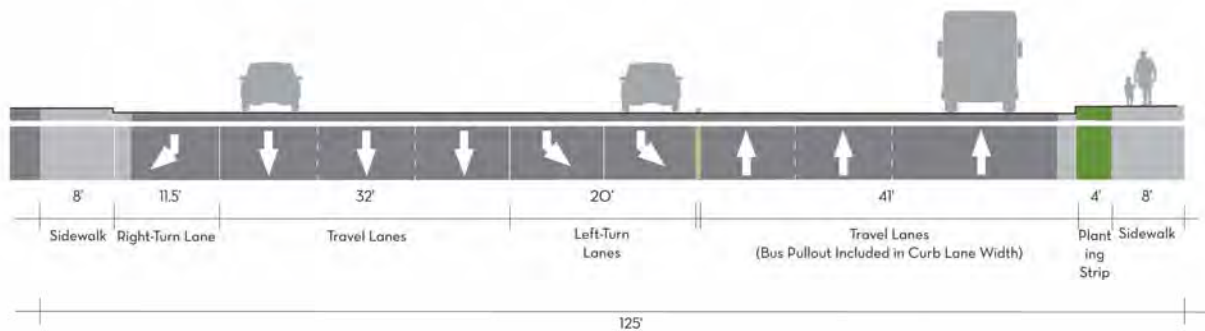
Sunrise Boulevard Focus Area Plan Sheet 1
